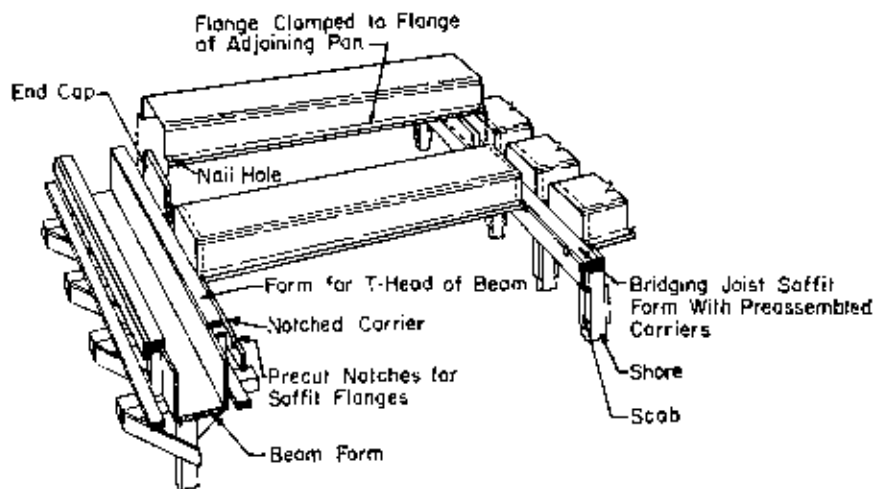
One-way slab form. (Courtesy of American Concrete Institute)
